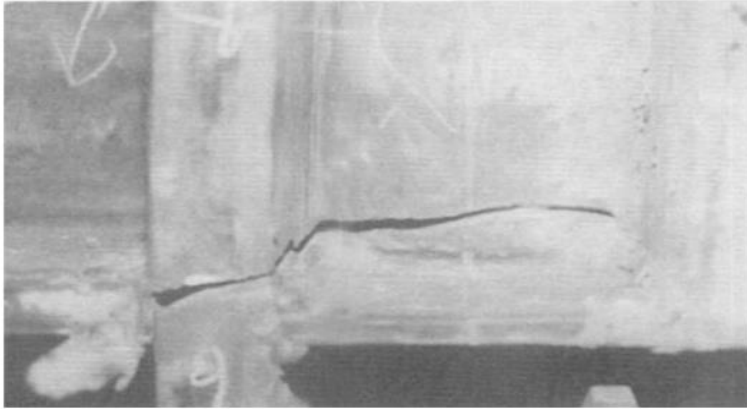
shows typical beam-column connection fracture seen following the Northridge earthquake. Photograph courtesy of EQE International (Papazoglou, & Elnashai, 1996)
